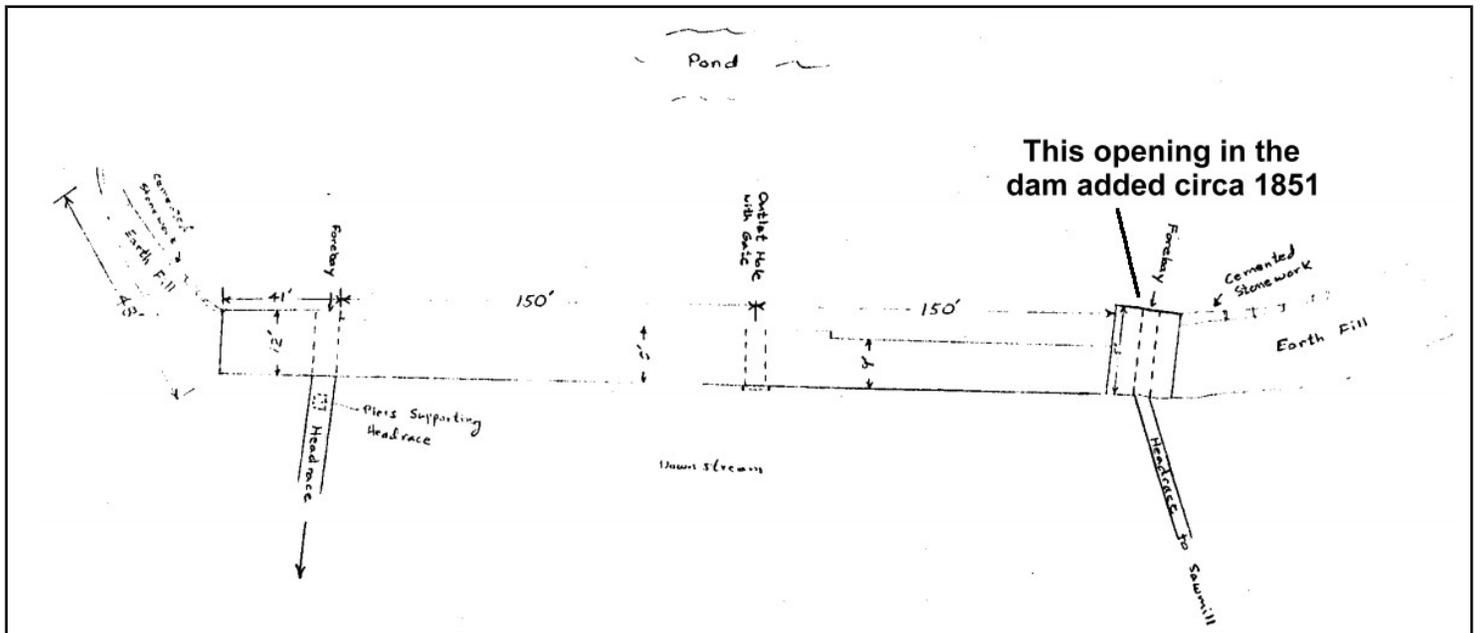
Top view of mill dam. Drawing by Donna S. Fabric
